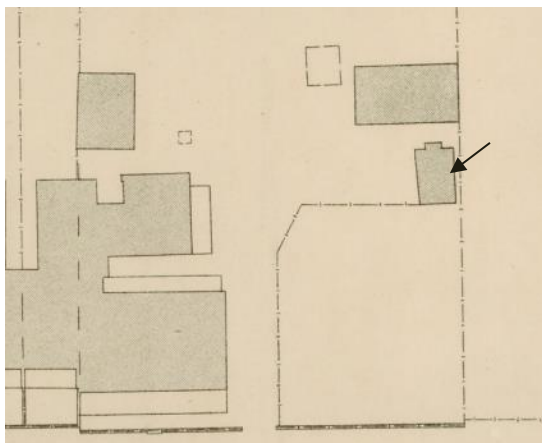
Small cottage with a chimney on the northern side depicted on the 1895 plan. (Source: SLNSW)
